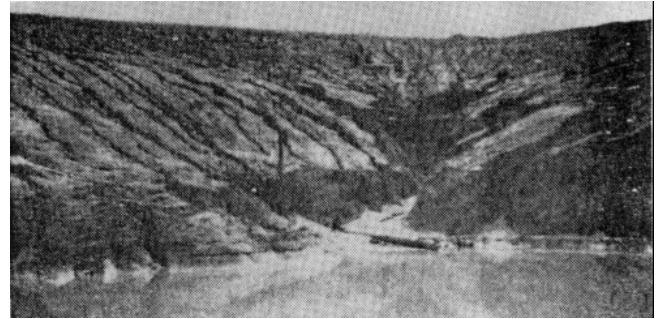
Surface erosion of unprotected construction slope of Kaskaskia Dam, Illinois
